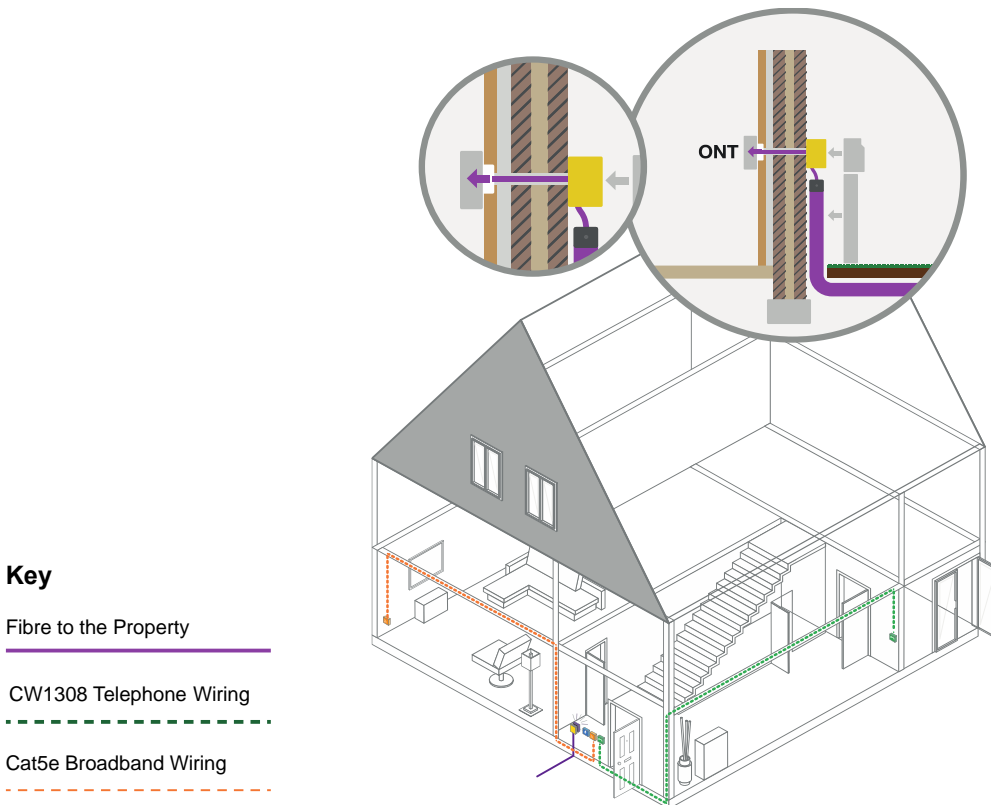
Typical house layout – ONT located within utility cupboard or hallway
